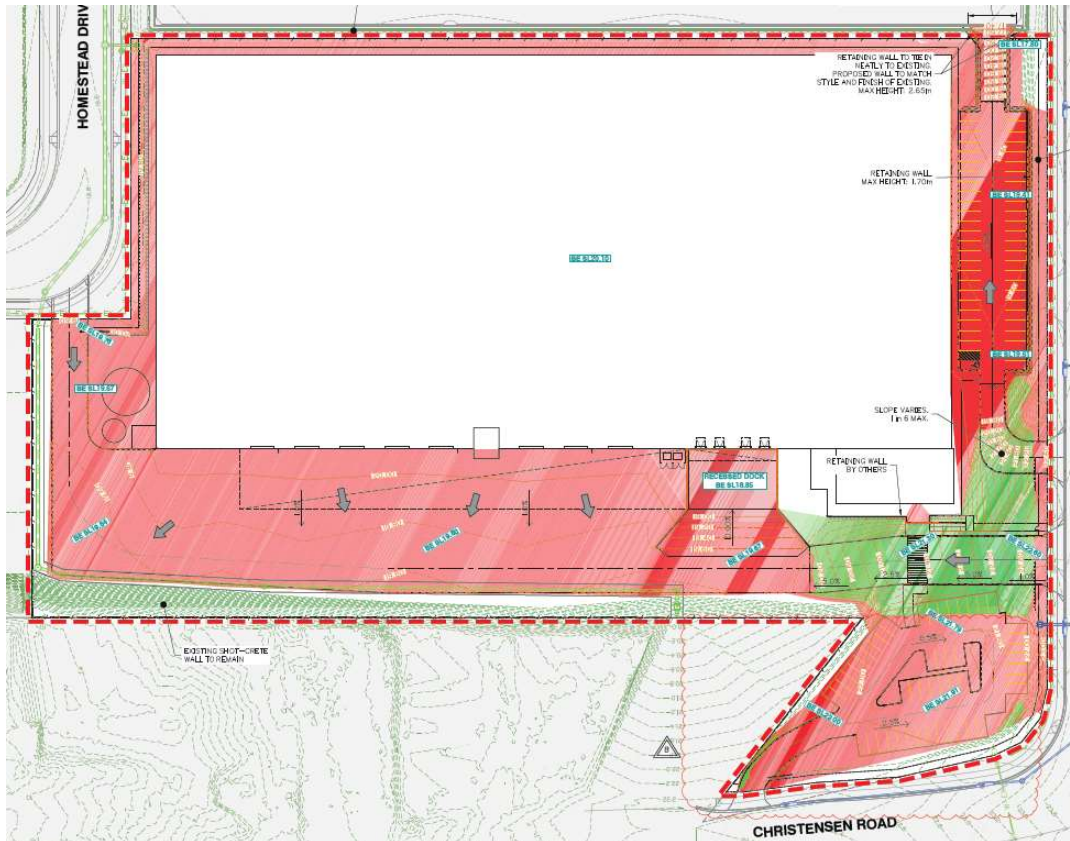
Bulk Earthworks Layout Plan (Source: Applicant submitted material)
